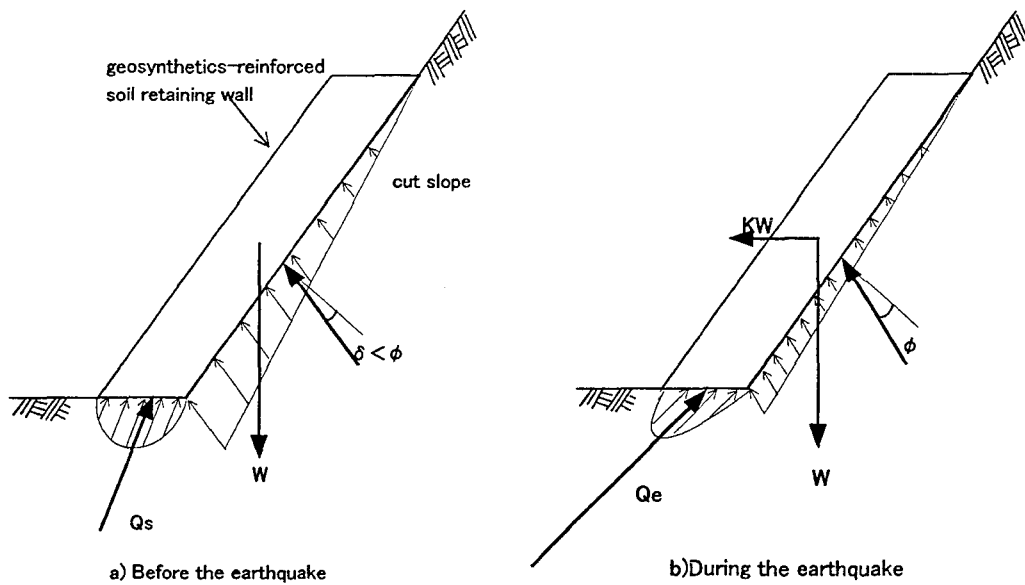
Schematics of forces acting soil retaining wall on the soil retaining wall
